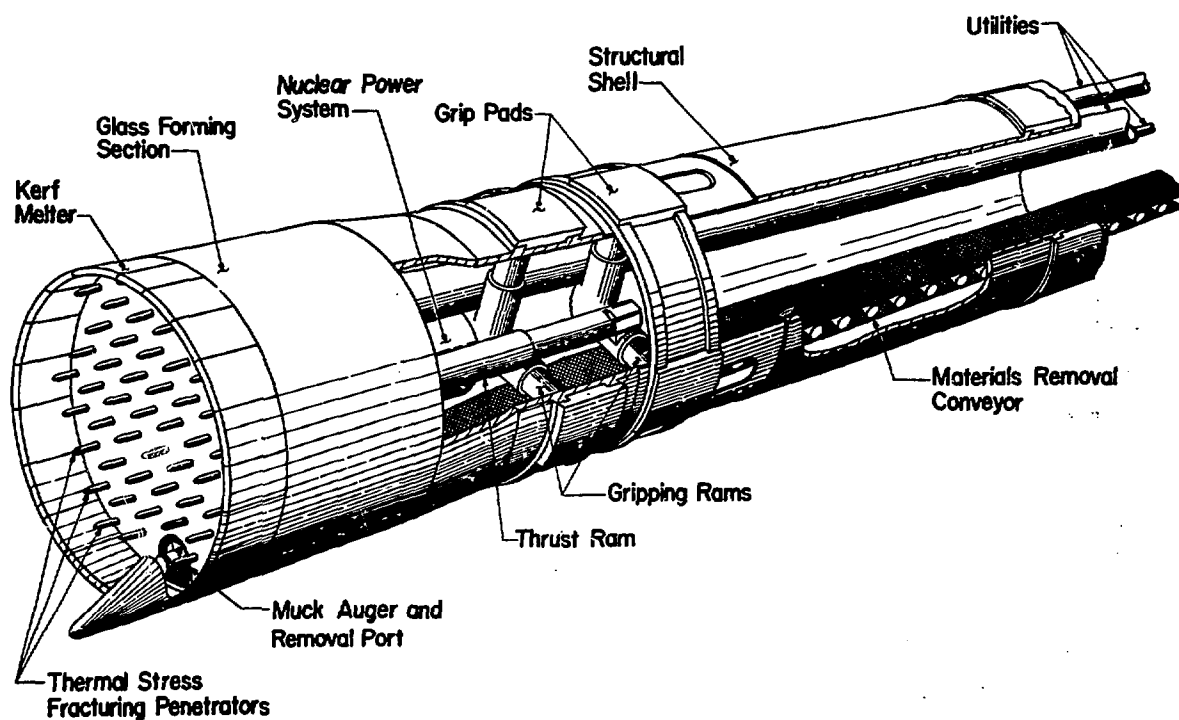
Design concept of the penetrating face of a hard-rock melting tunneler utilizing the kerfing technique and thermal stress fracturing.
